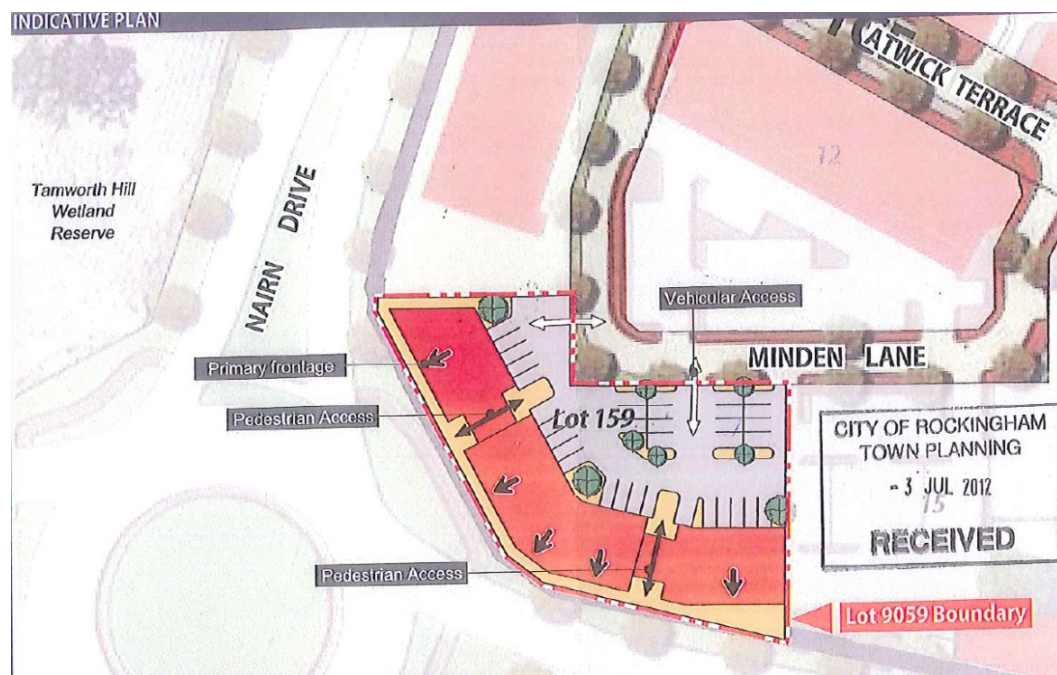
North West corner of Settlers Ave/Atwick Terrace Intersection
